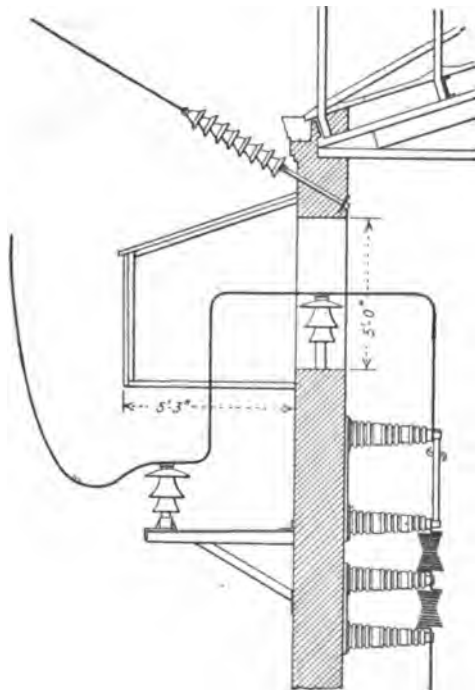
MEXICAN LIGHT AND POWER CO., LTD. ARRANGEMENT OF OUTLET FOR LINE FOR 85,000 VOLTS AT NECAXA POWER HOUSE NO. 1
